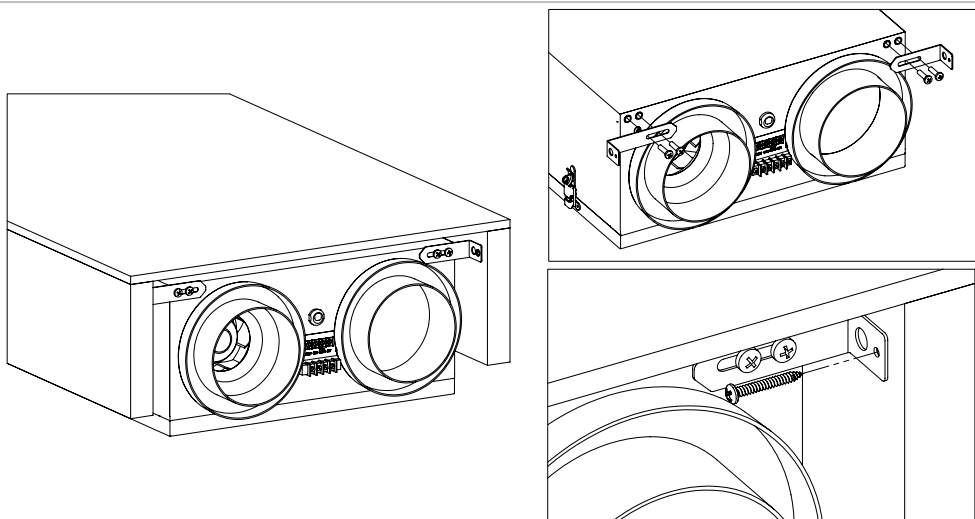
HORIZONTAL INSTALLATION BETWEEN JOISTS
